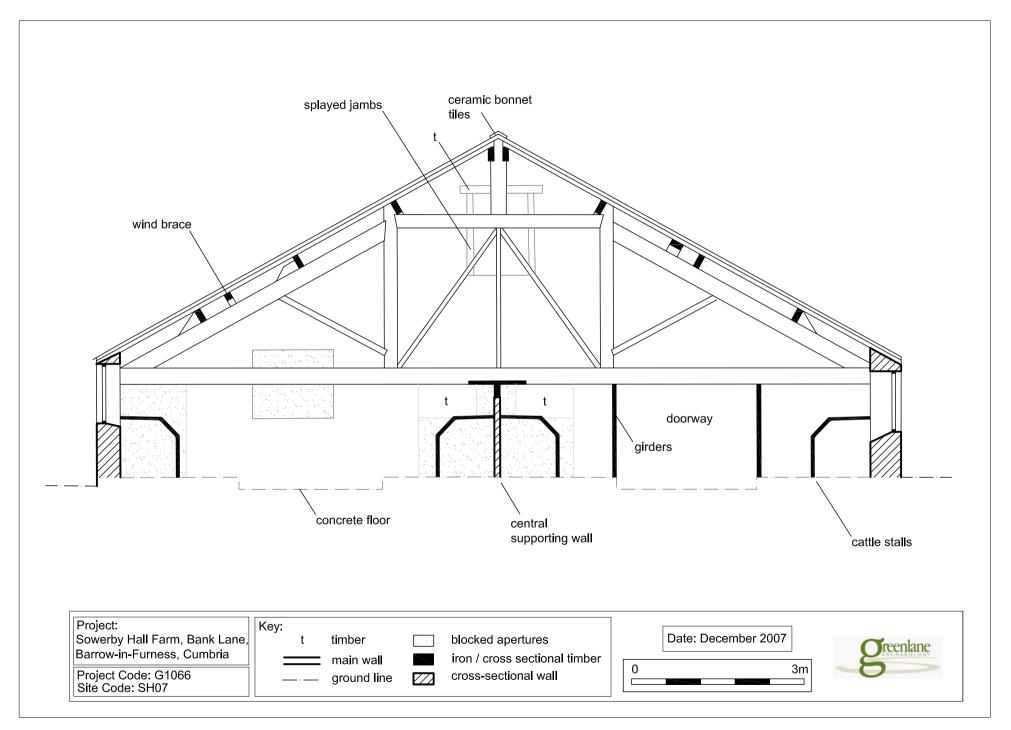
South-facing cross-section (C-C) through the shippon, Truss X
